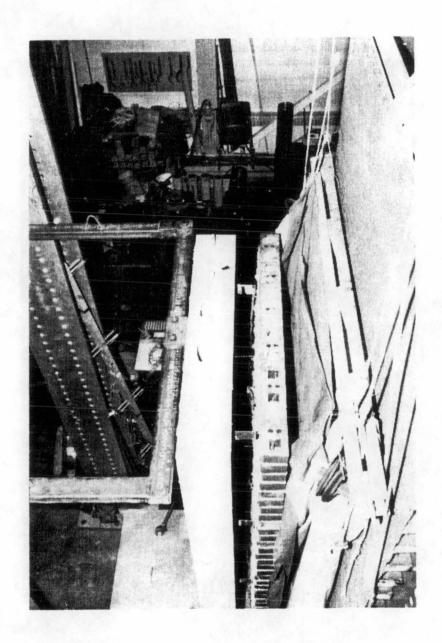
Reinforcement and Grouting of Specimen S2W3
